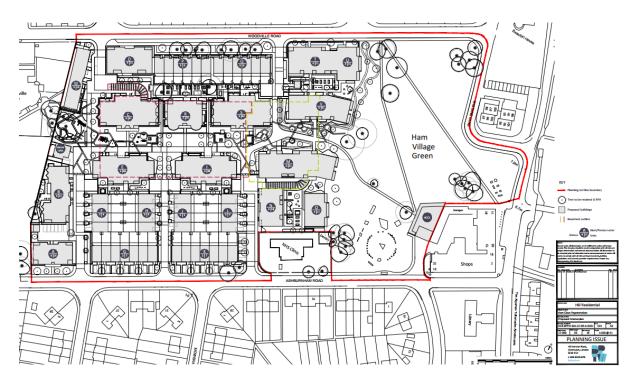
Masterplan providing an overview of the site layout (BPTW drawing HCR-BPTW-S01-ZZ-DR-A-0102-C01)
